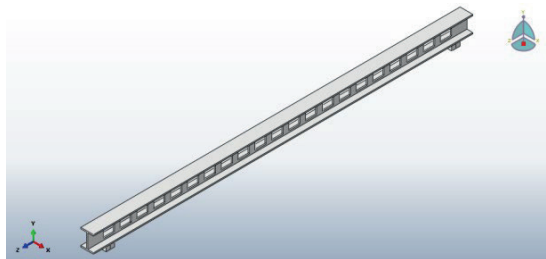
Modelling of loading pressure on top face of the steel beam sample
